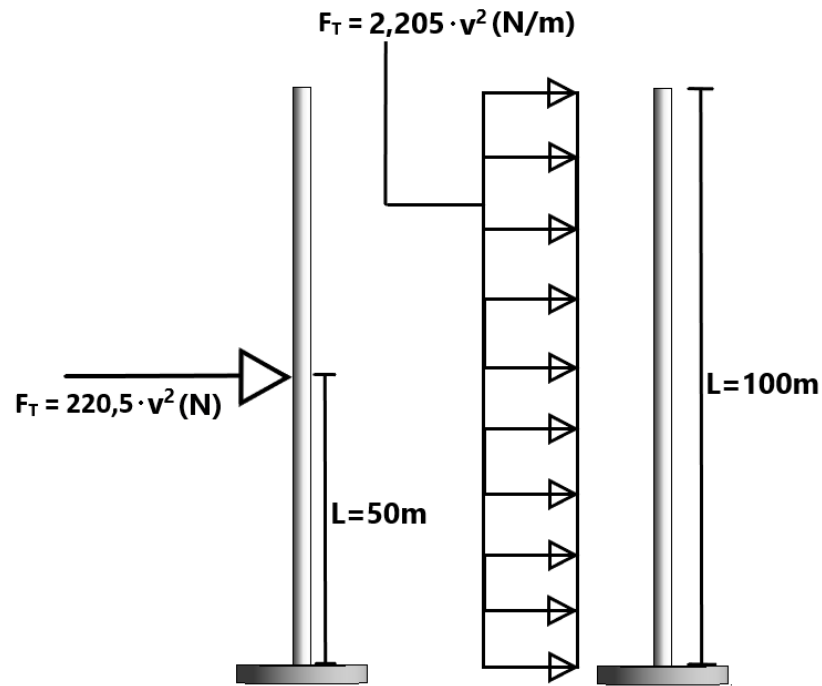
Model of the wind load acting on the tower. The towers are modelled in Autodesk Revit.
